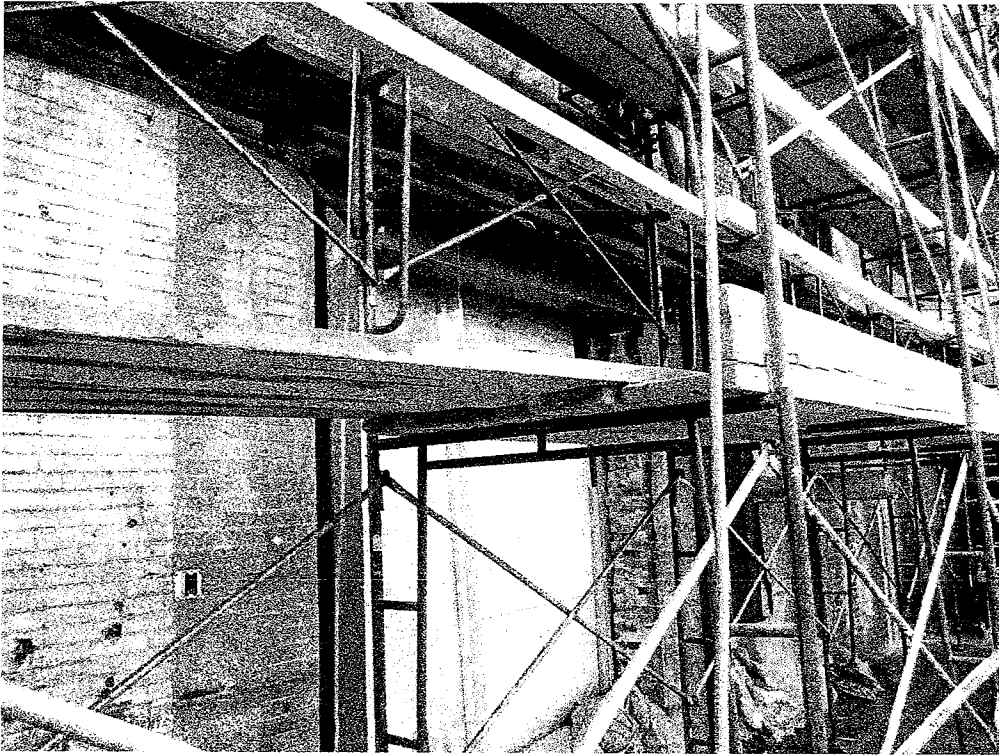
Grid F/7 steel column and steel lintel beam installed.
